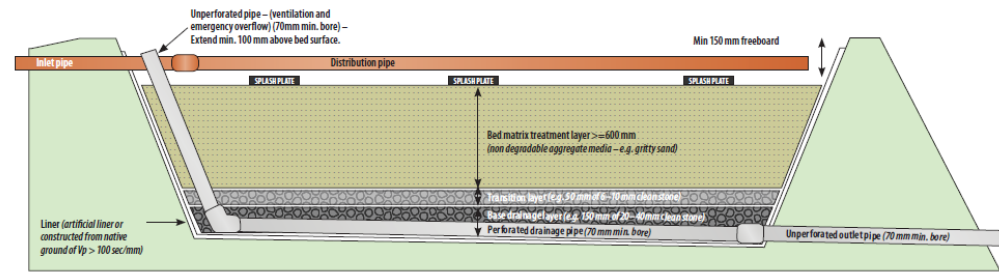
Typical longitudinal section through a vertical flow constructed wetland prior to planting
